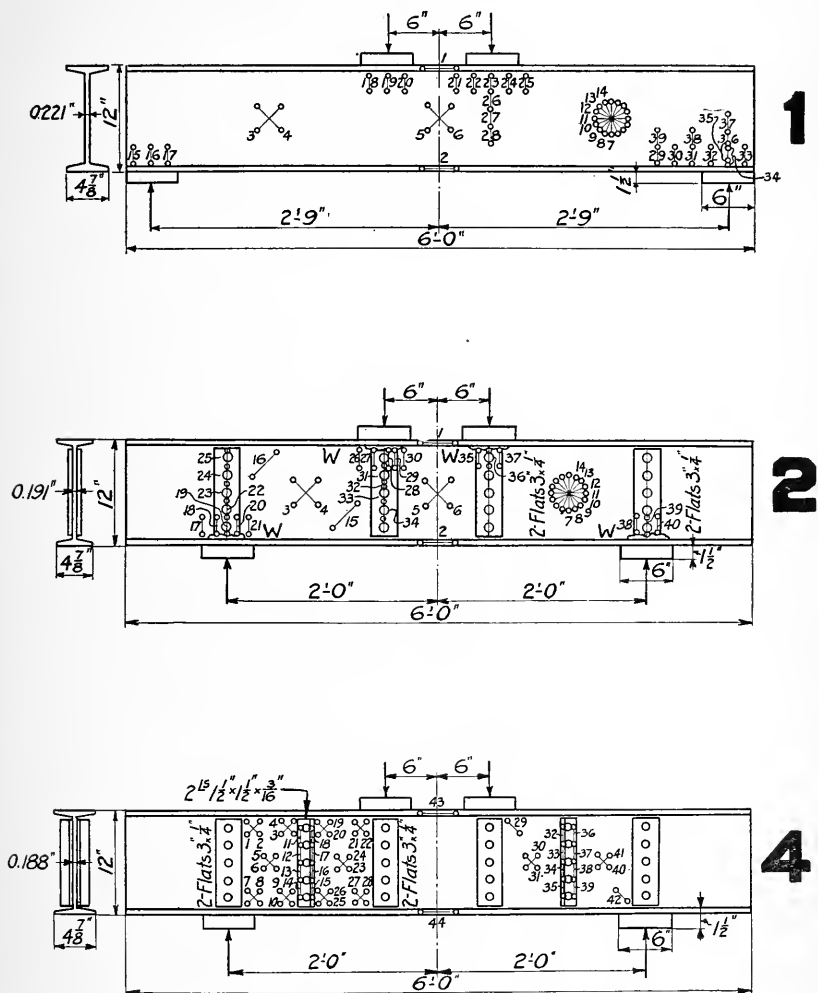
I-BEAMS 1, 2, AND 4 SHOWING LOCATION OF GAGE LINES (W DENOTES AN OXY-ACETYLENE WELD)
